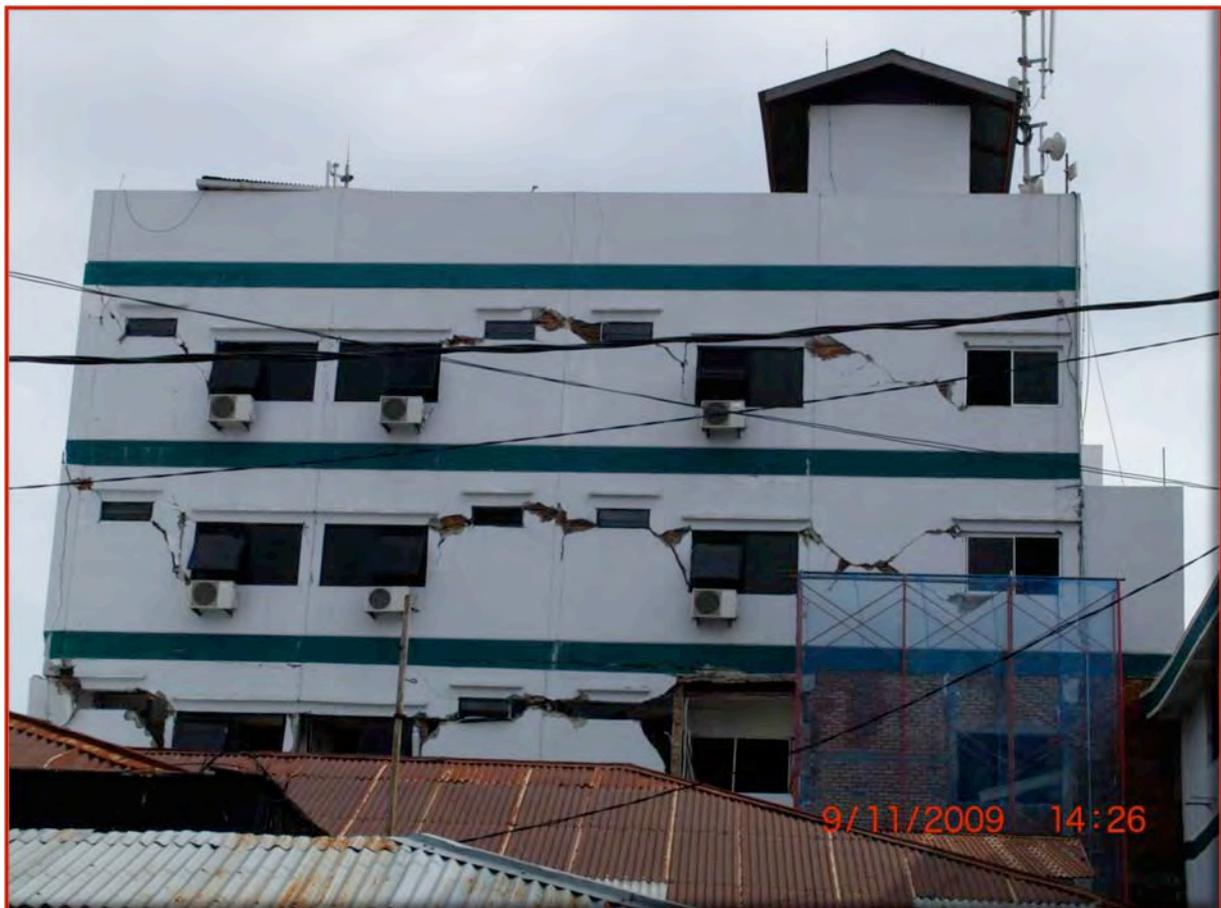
Bunda Medical Centre showing extensive cracking of non-structural masonry.
